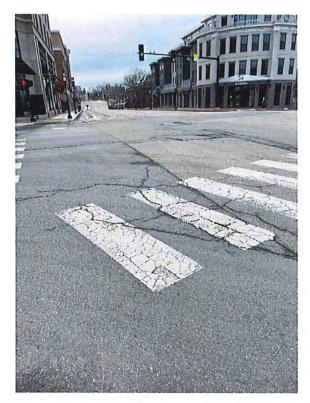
Maplewood Ave and Deer Street intersection looking south. Taken 1/19/23
